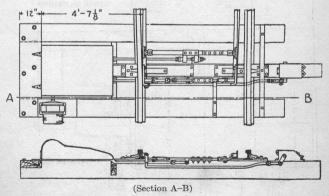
Single Switch Operated by Model 2 Switch Machine
